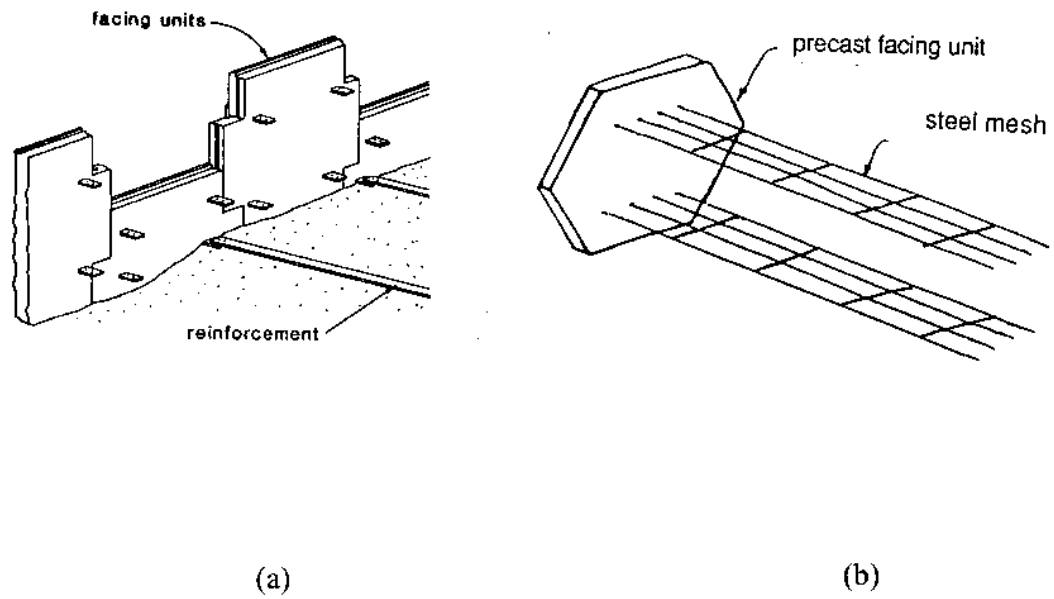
Examples of steel reinforcement: (a) steel straps, and (b) steel mats (Jones, 1996).
